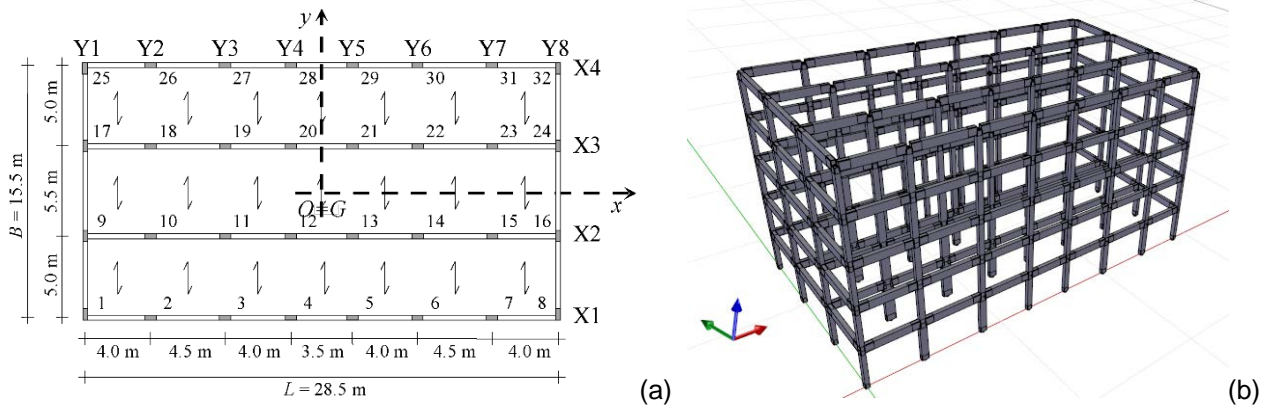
Plan layout (a) and 3D model (b) of the case study building.
